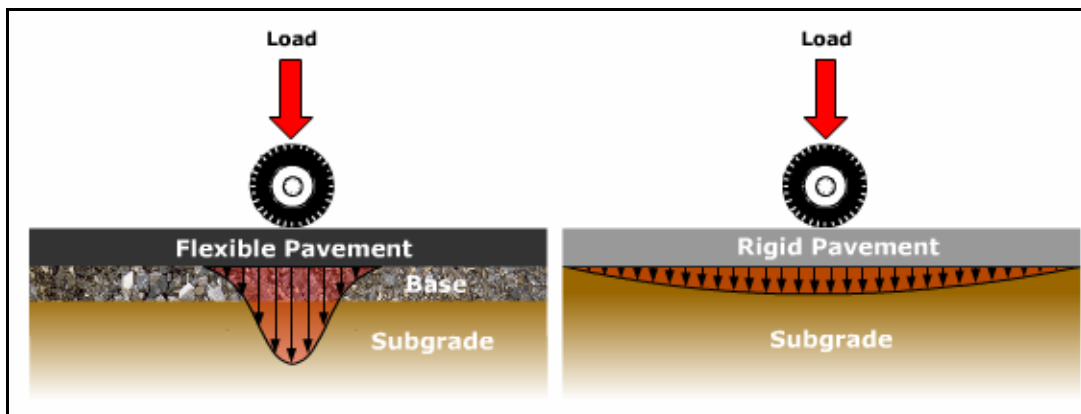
Flexible and rigid pavement loading distribution (14).
